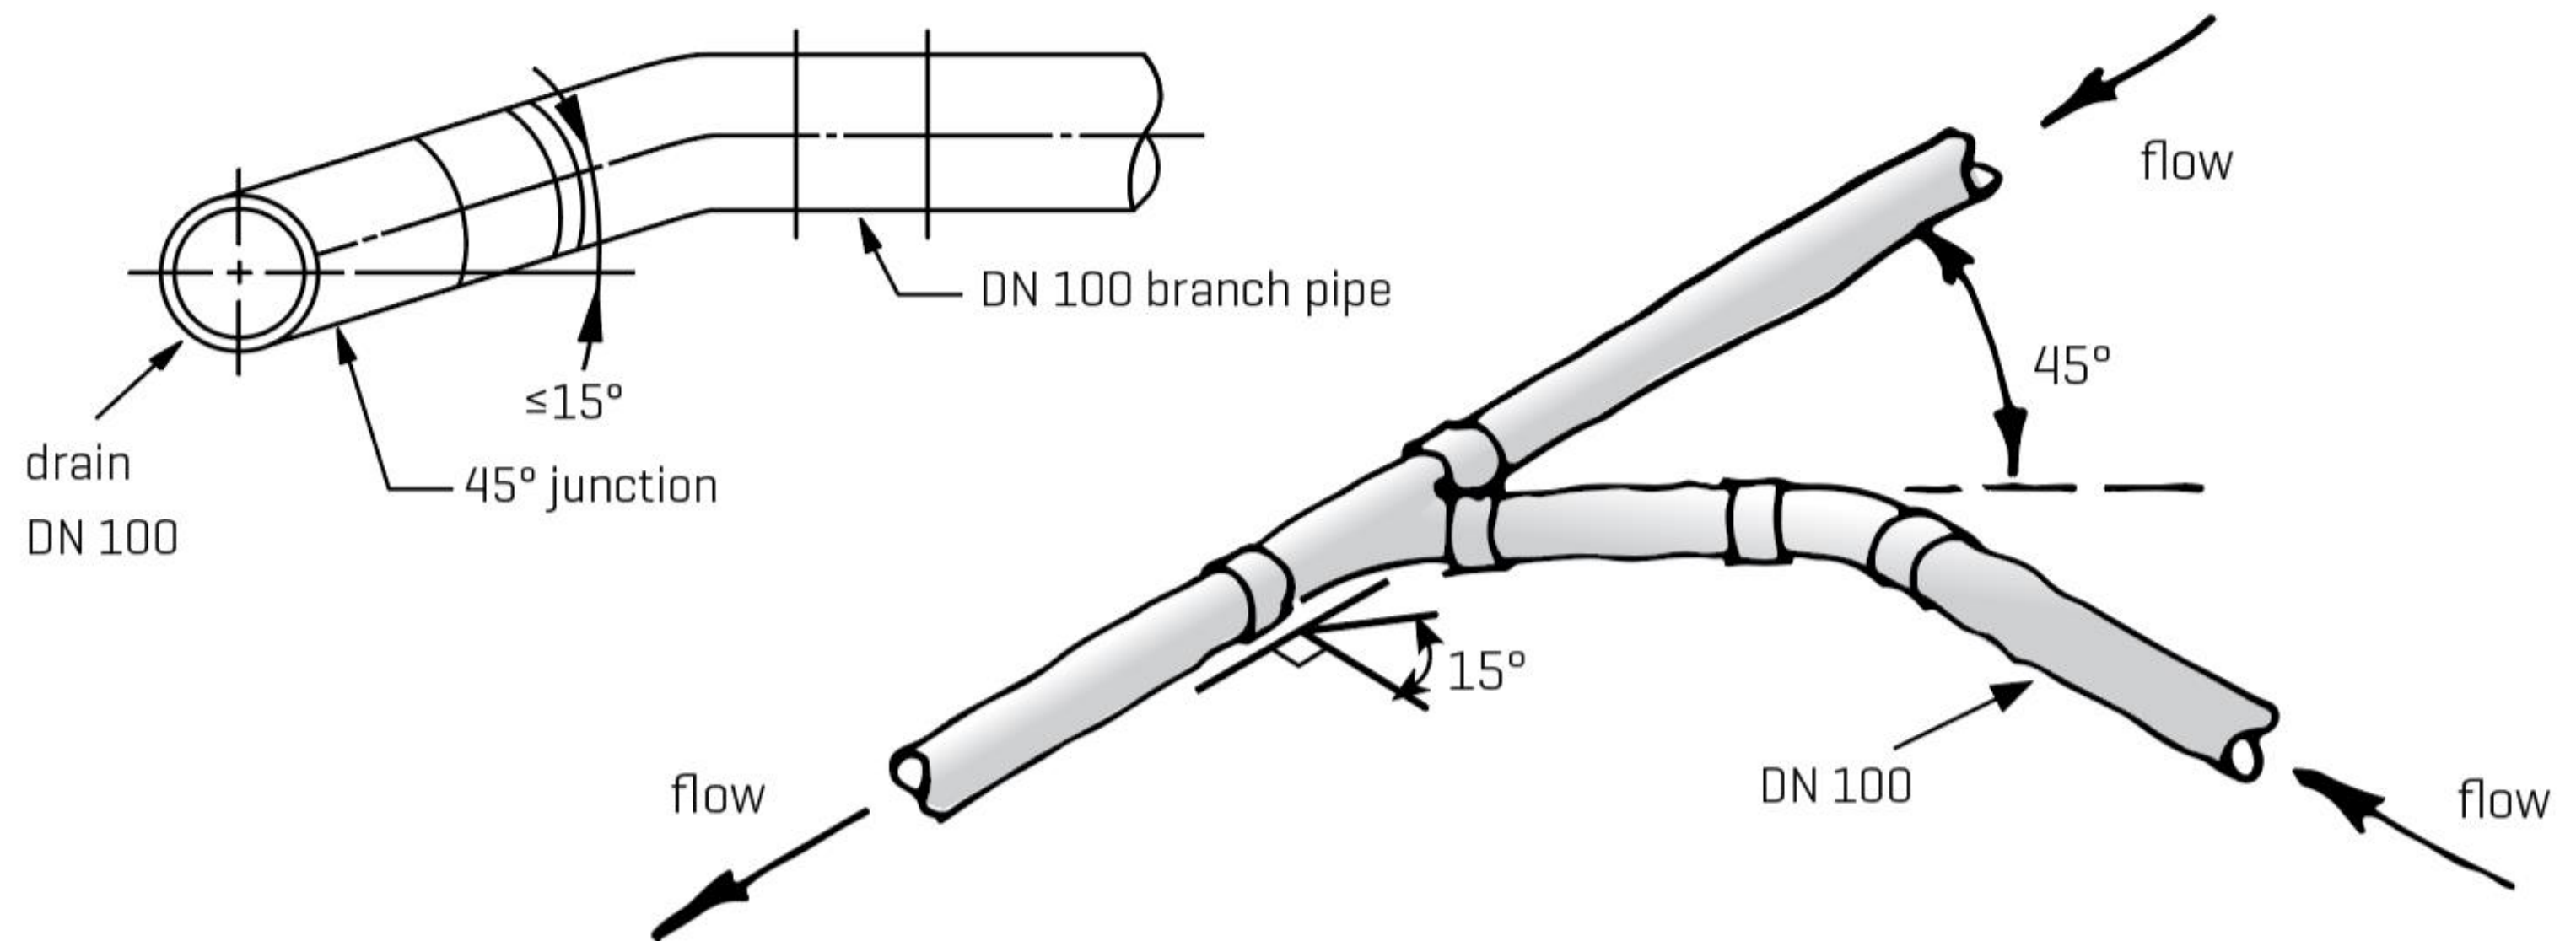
100 mm branch pipe to 100 mm pipe on grade.
